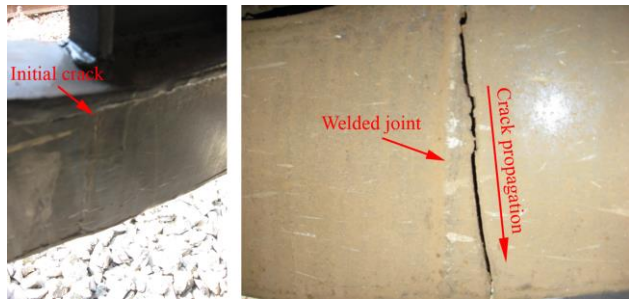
Initial crack and crack propagation nearby welded joint
